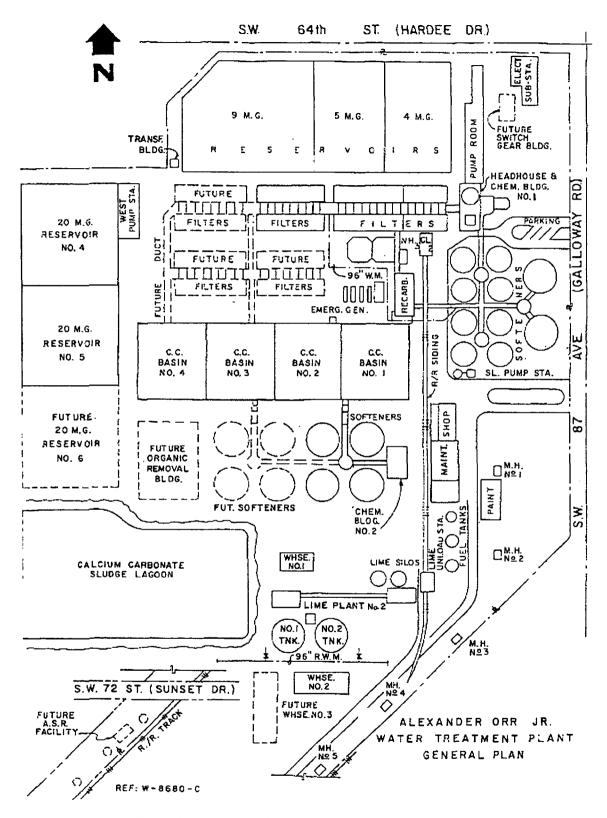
Alexander Orr, Jr. Water Treatment Plant Layout
